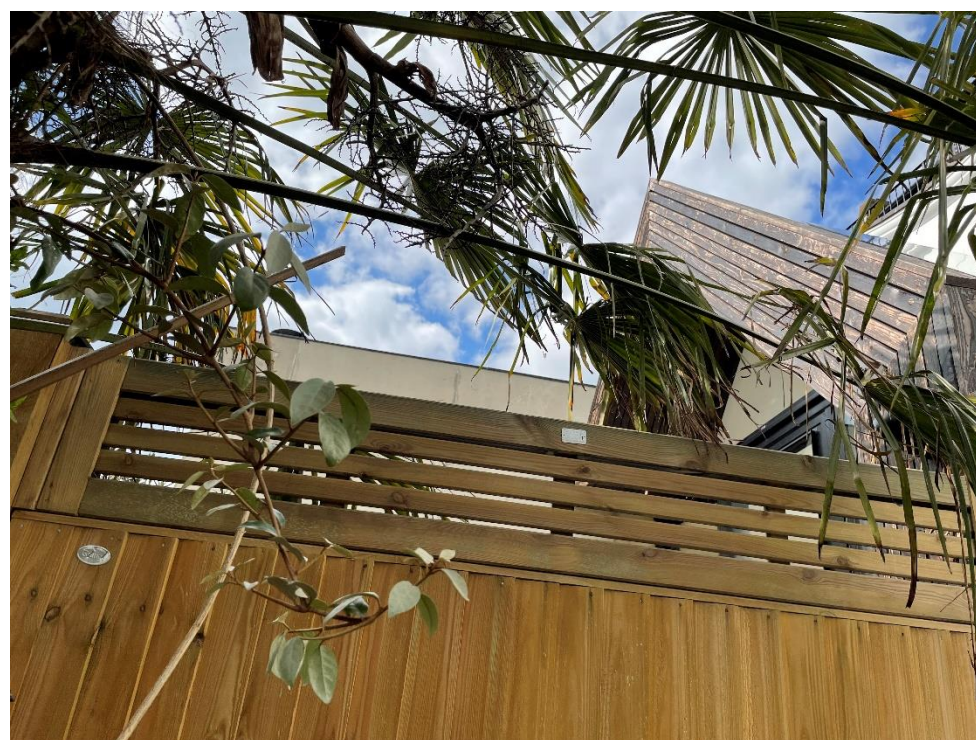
& 7 - Existing extension at N. 36 Nassau Road from 34 Nassau Road's garden
